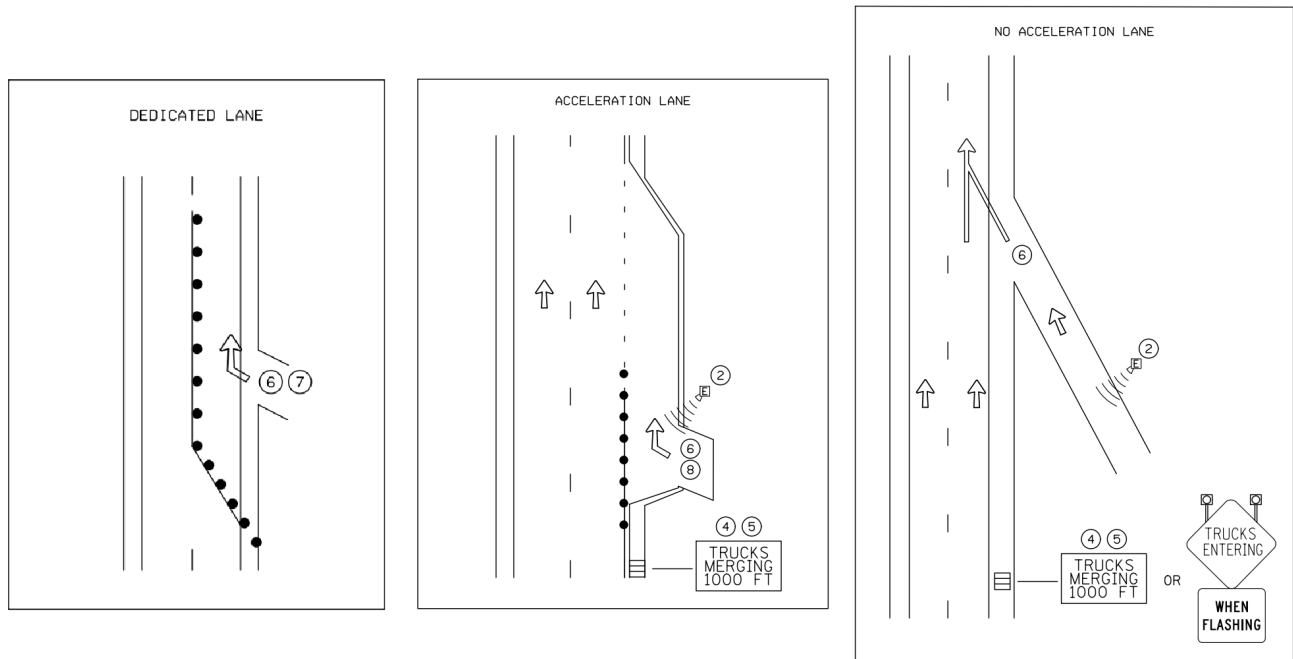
Photo. Example work zone layout with construction vehicle merging system (MnDOT, 2022a).
